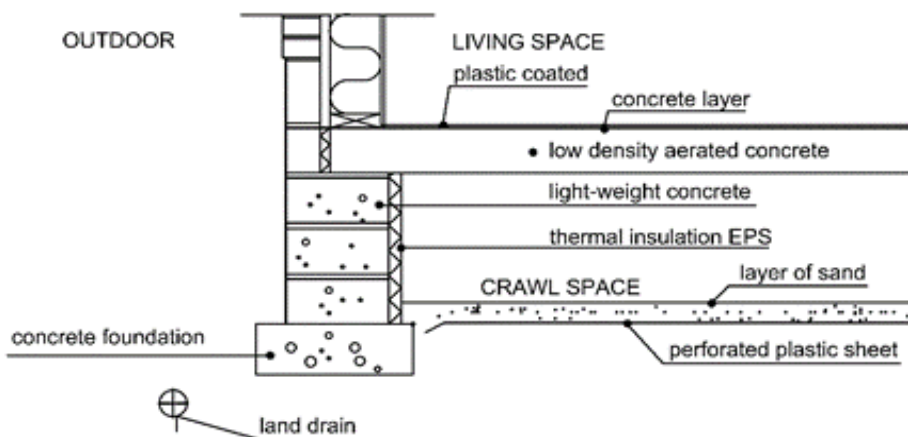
The sectional drawing of the crawl space foundation in the studied building.
